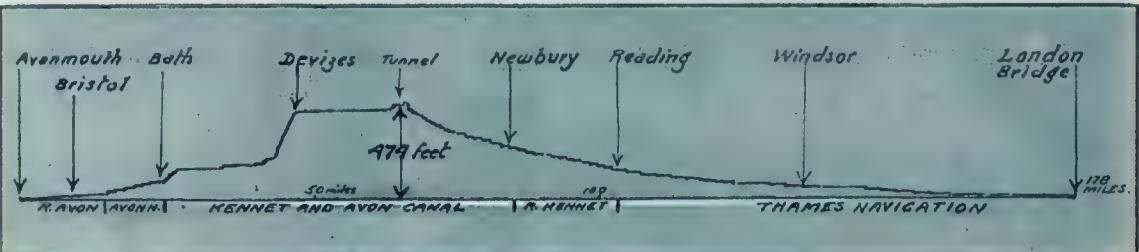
THE CANAL LINE BETWEEN LONDON AND BRISTOL SHOWN IN ELEVATION SECTIONAL DIAGRAM.
